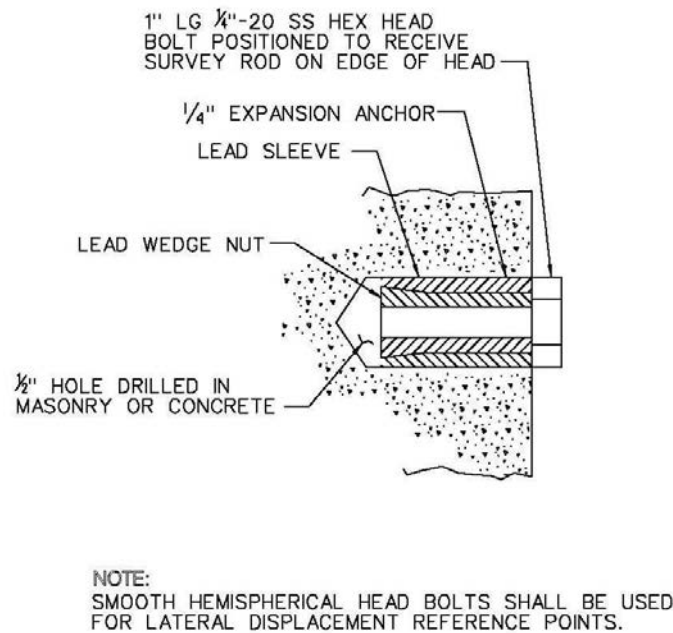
Structure Monitoring Point in Vertical Masonry or Concrete Surface
